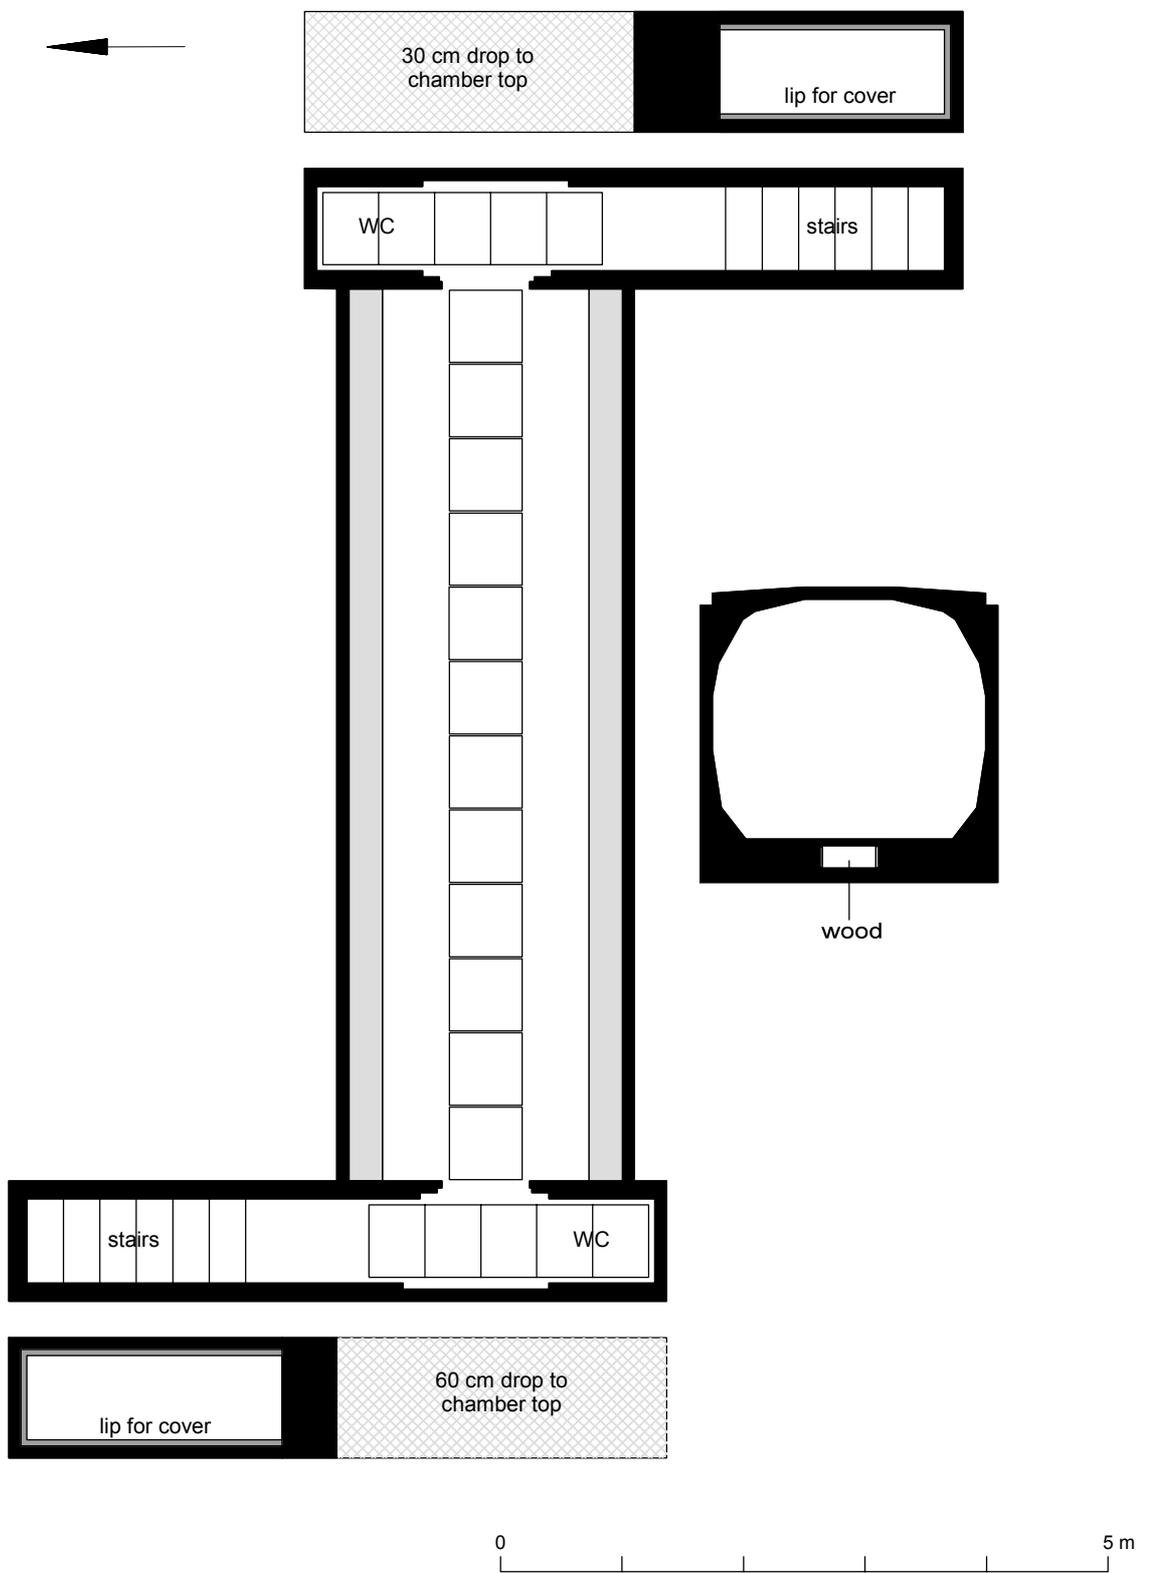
Area C2, air-raid shelter 3: internal plan and cross-section of chamber.
